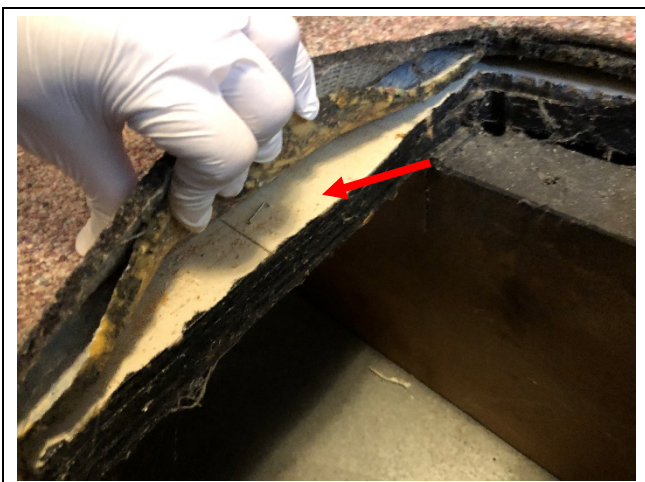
House – Asbestos-containing vinyl floor tiles – beige found beneath carpet in bedrooms 1-3, hallway and living room.
